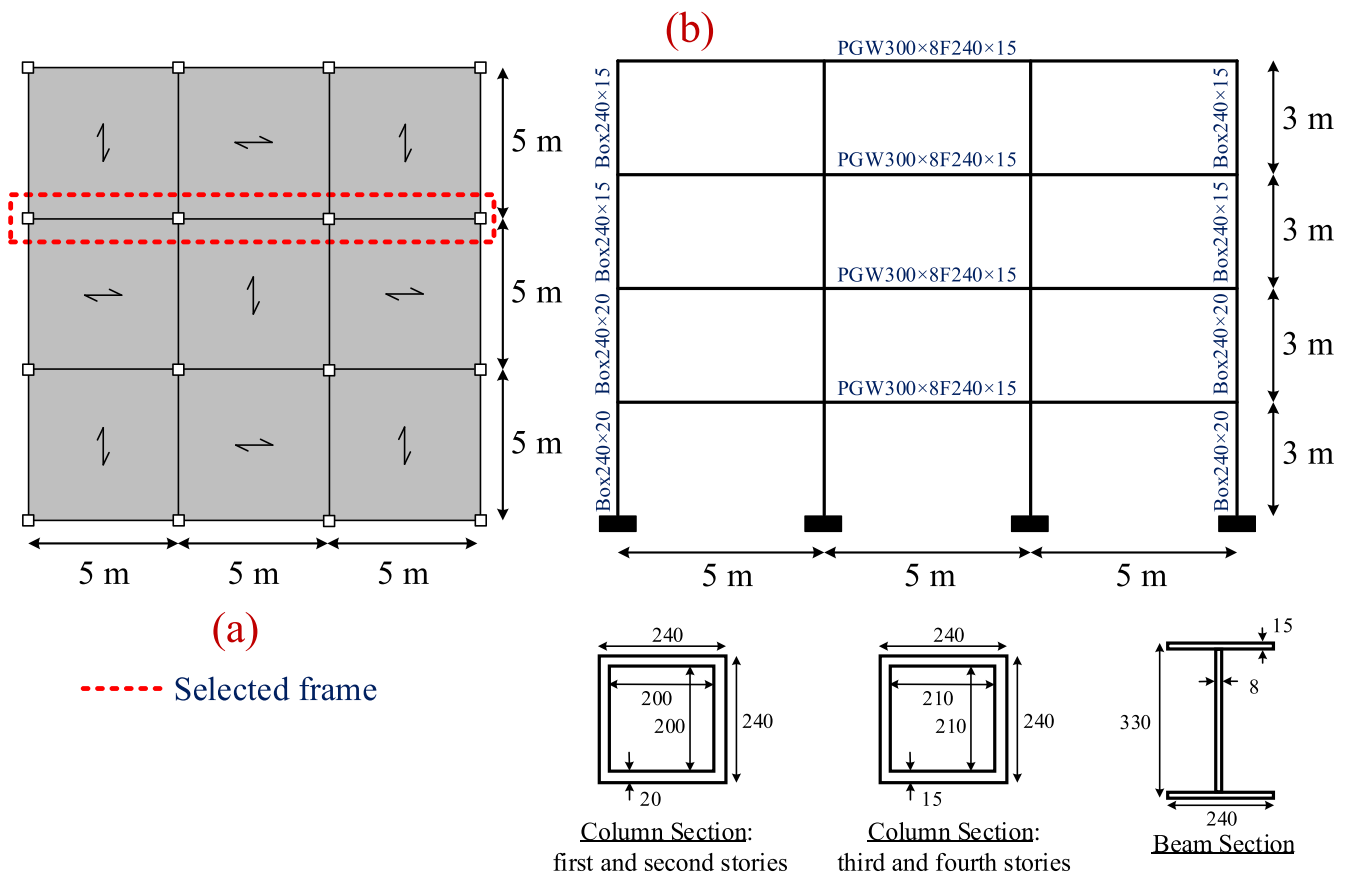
SMF building: (a) plan view, and (b) elevation and box column and beam sections.
